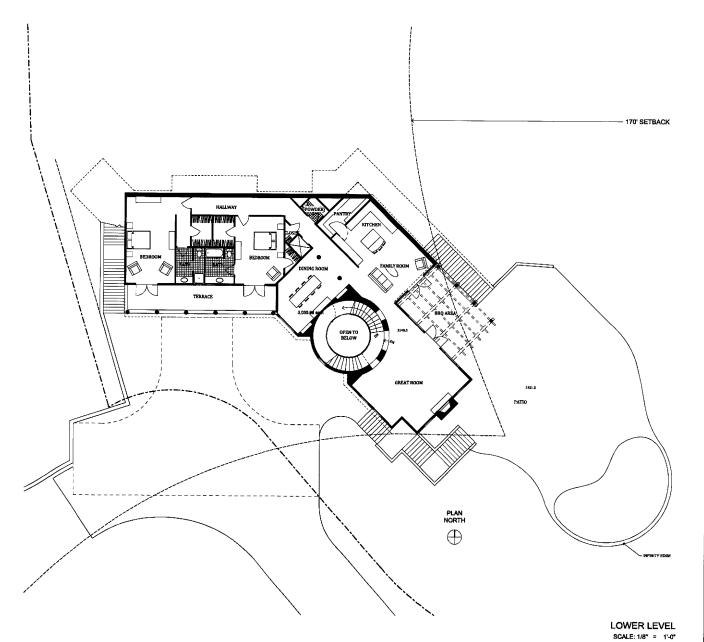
CDP 4-10-104 Proposed Site Plan, Floor Plans, Elevations
